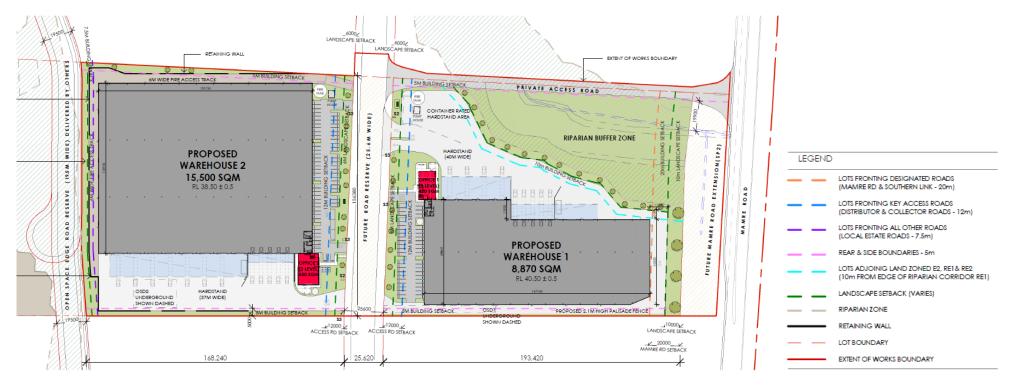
Proposed site plan identifying Warehouse 1 and Warehouse 2
